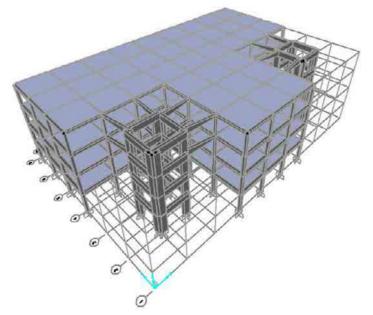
General view of the T-shape plan building retrofitted by using two external stiff structures
